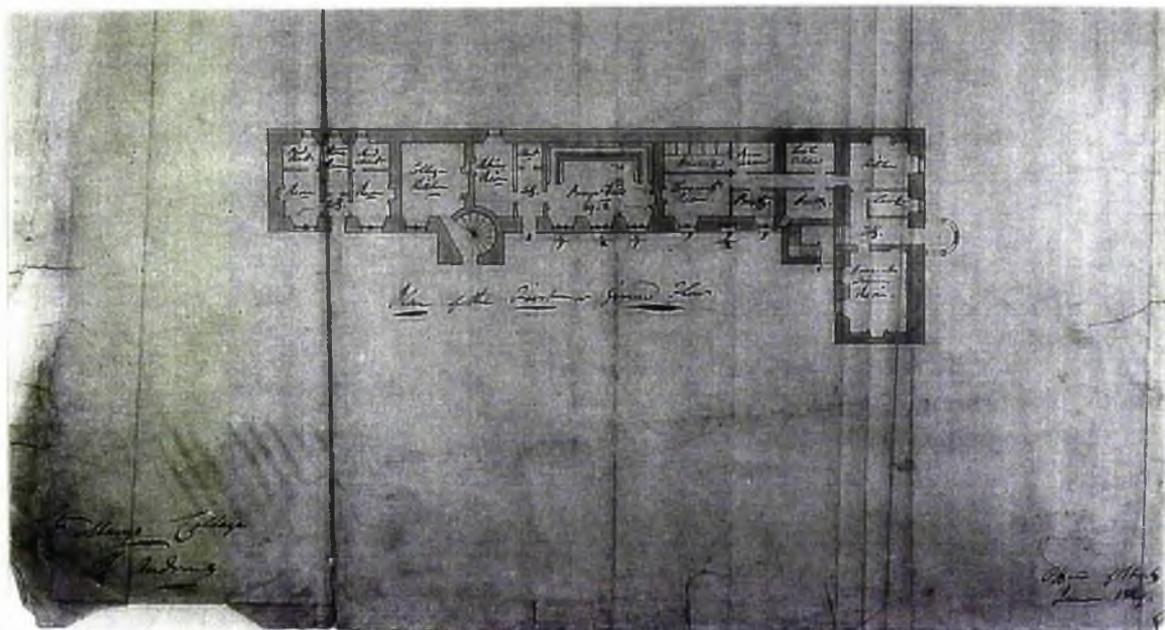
St.Mary's College. Proposed alterations to ground floor. R. Reid, June, 1829.
